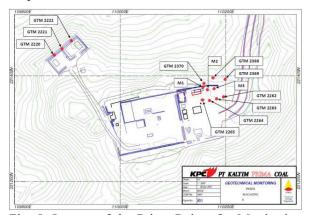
Layout of the Prism Points for Monitoring the Wash Pad Location, Bengalon Site.
